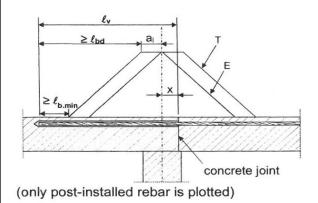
Anchoring of reinforcement to cover the line of acting tensile force
